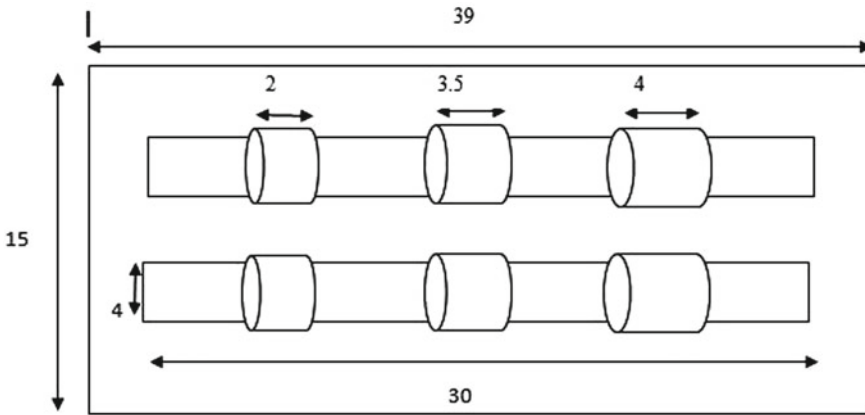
Schematic layout of 3D numerical model of concrete structure (all dimensions are in cm)
